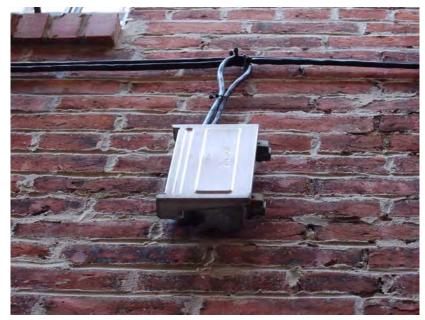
Surface mounted telephone box and cable. (Photo: BBB, 2007)
